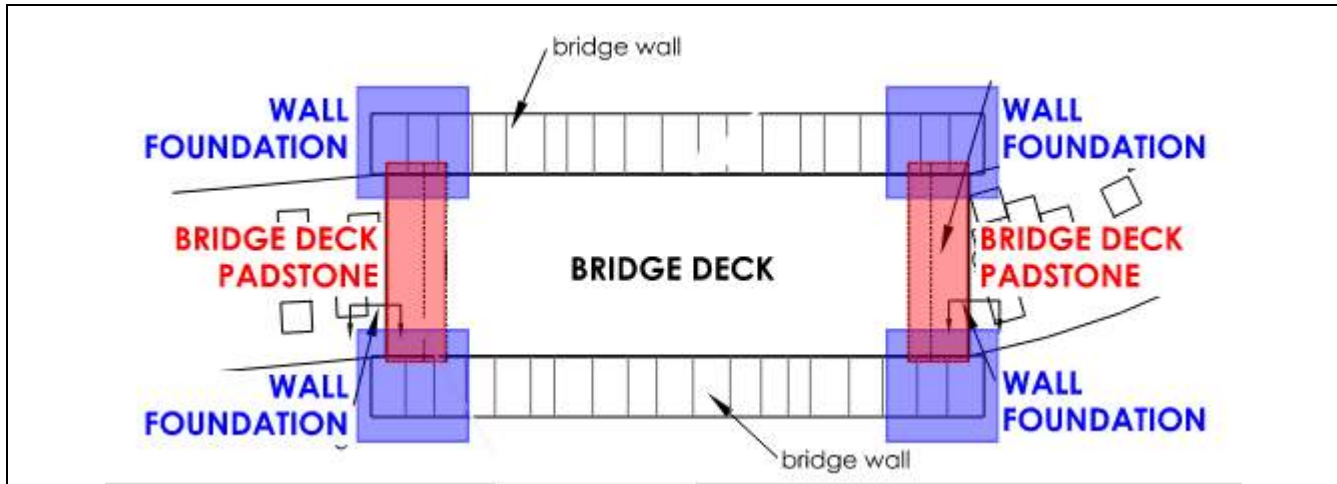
Plan: Bridge Deck, Wall, Padstone and Foundation References
